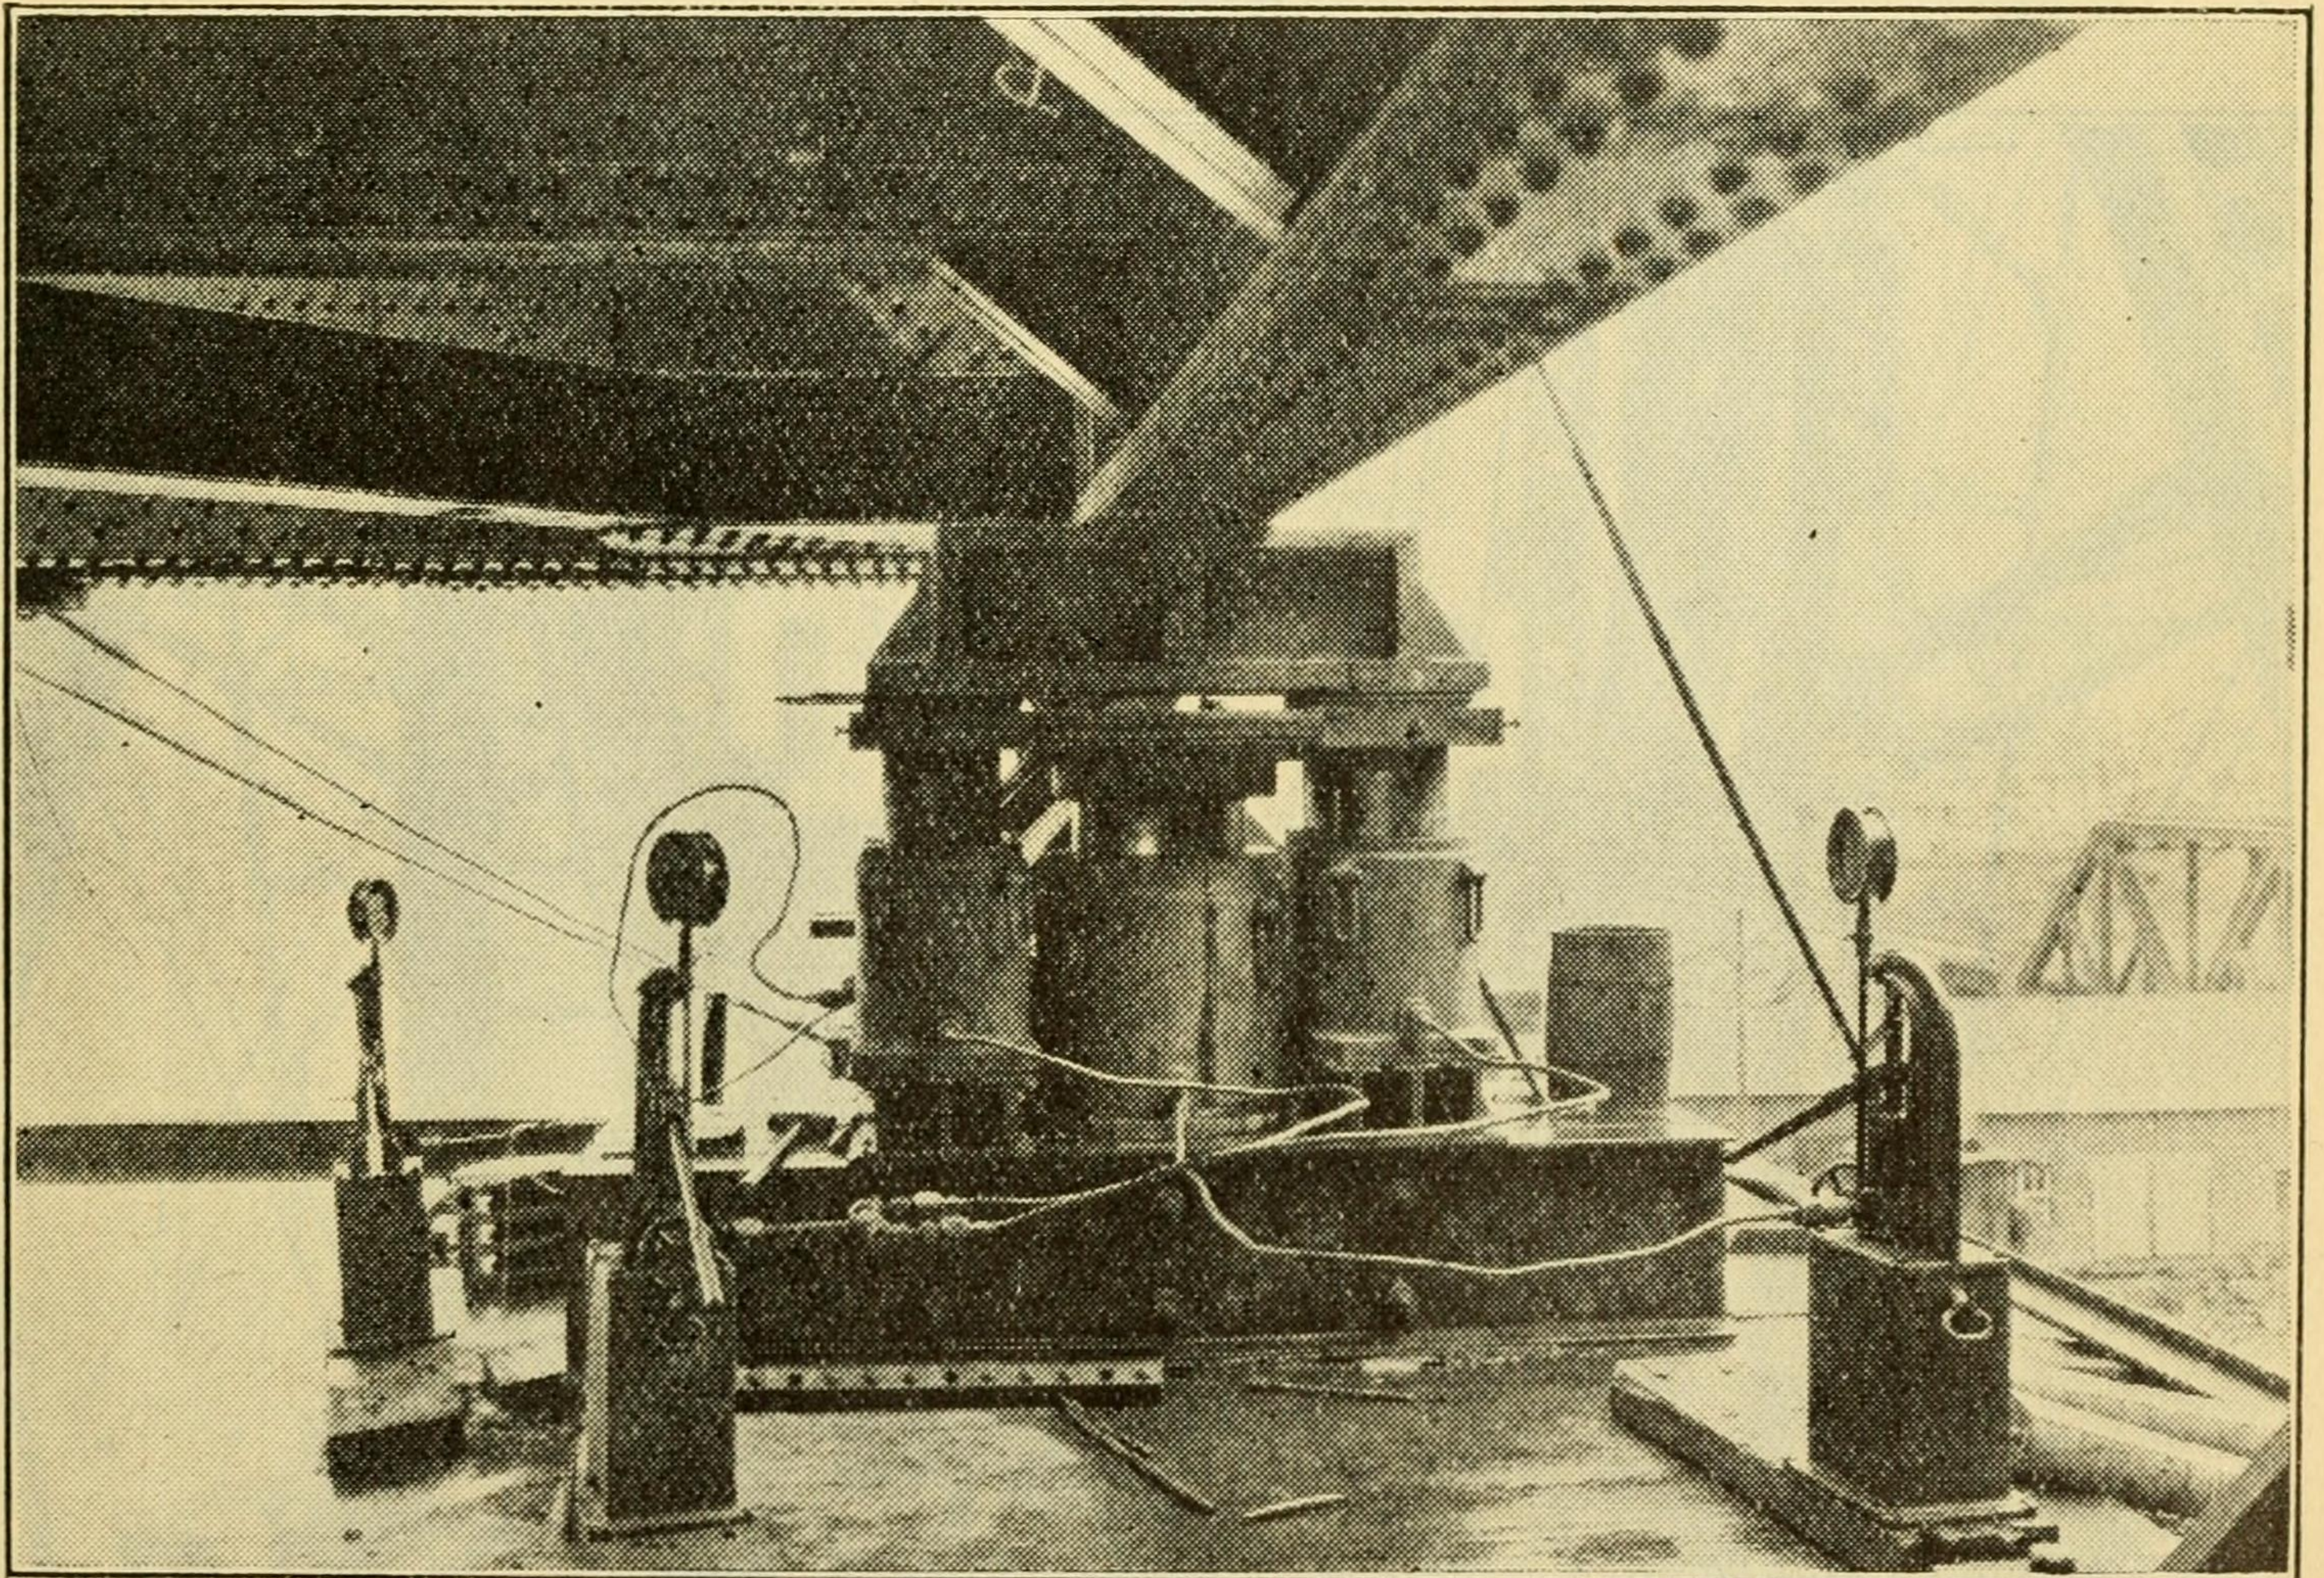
ADJUSTMENT OF KENTUCKY SPAN, SCIOTOVILLE BRIDGE, BY HYDRAULIC JACKS.
